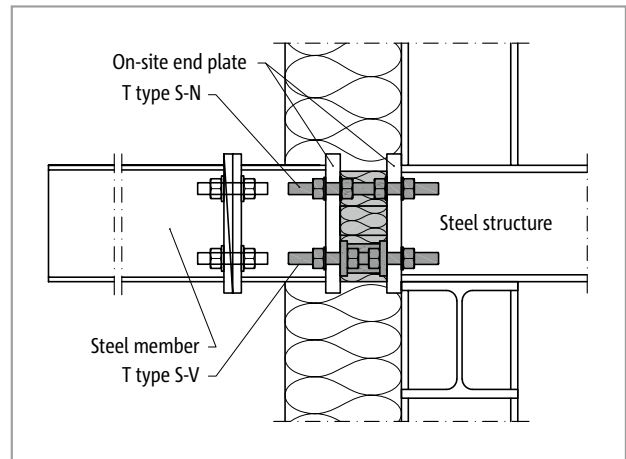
Schöck Isokorb® T type S for cantilevered steel structures; including first fix bracket
